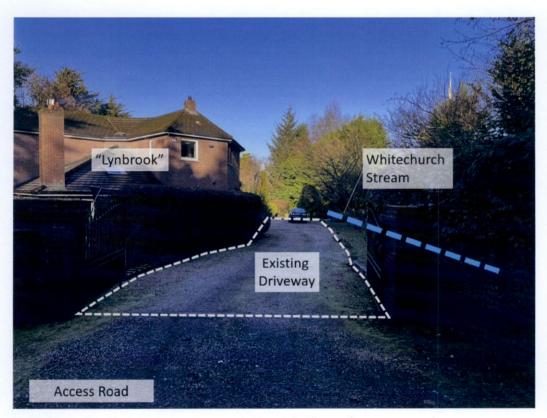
Looking North towards entrance to Lynbrook & driveway from access road
